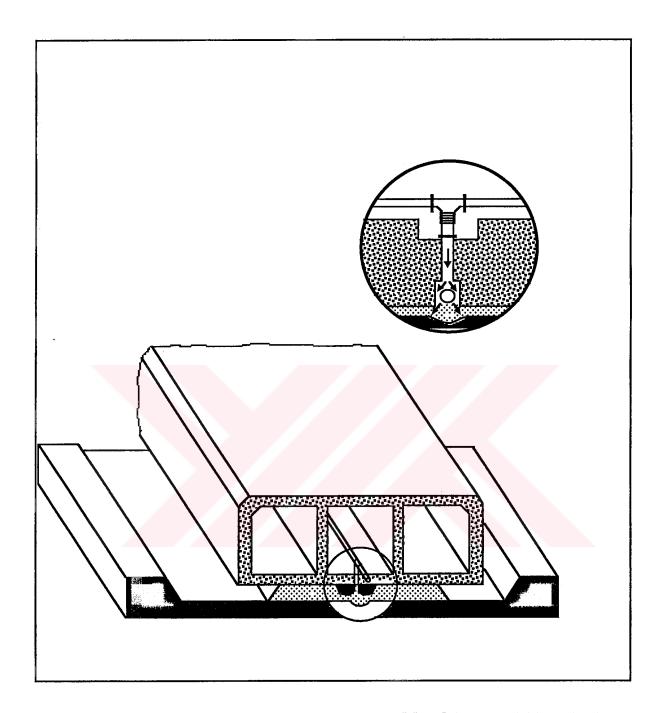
SANDFLOWING THROUGH THE FLOOR OF THE TUNNEL UNIT
